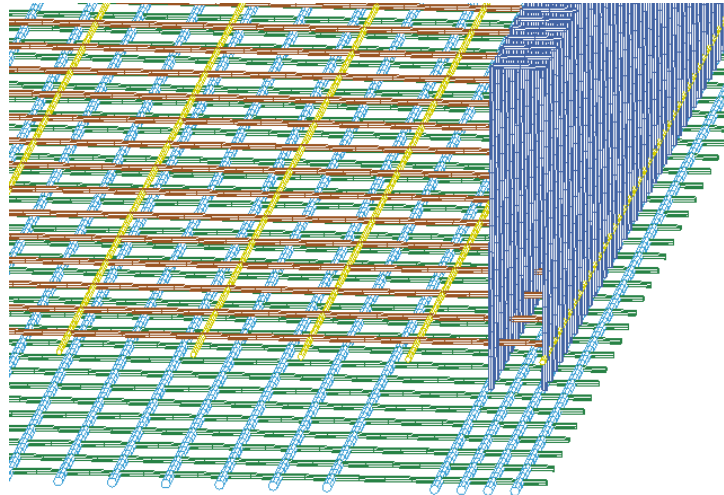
Zoom-In View of Rebars in the Archetype 1 Bridge Model
